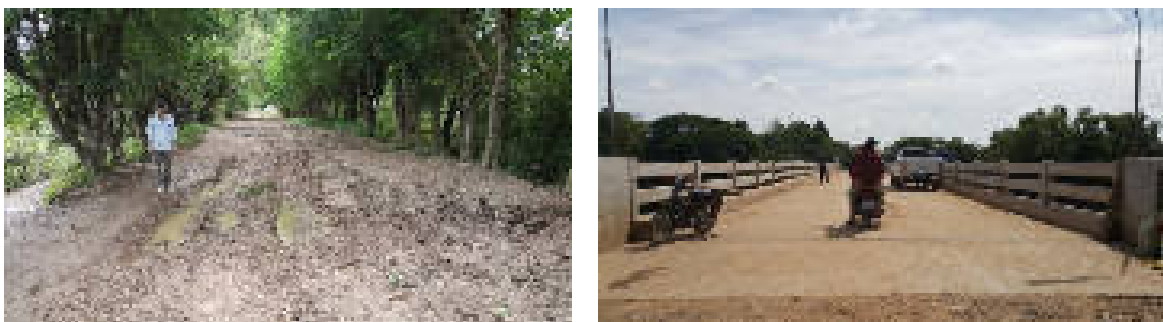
Existing Road and Wat Chroy Bridge.4
